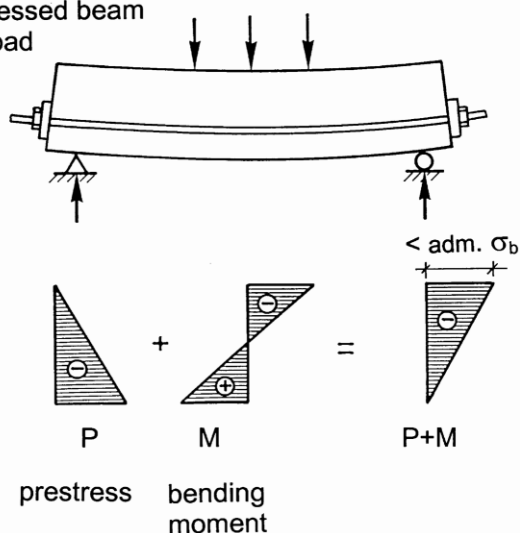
Principle of prestressed concrete (post-tensioned concrete with internal prestressing)
